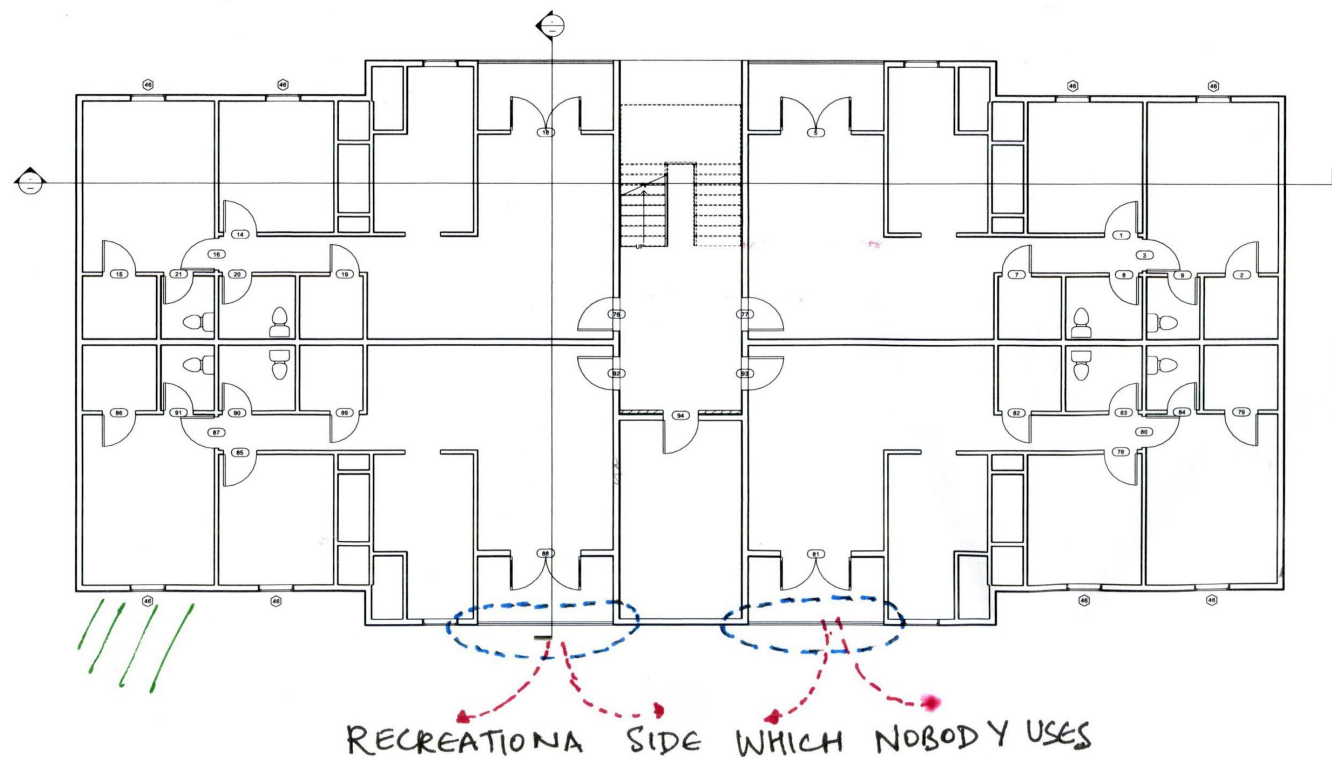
FLOOR PLAN OF A MULTI- FAMILY RESIDENTIAL UNIT
